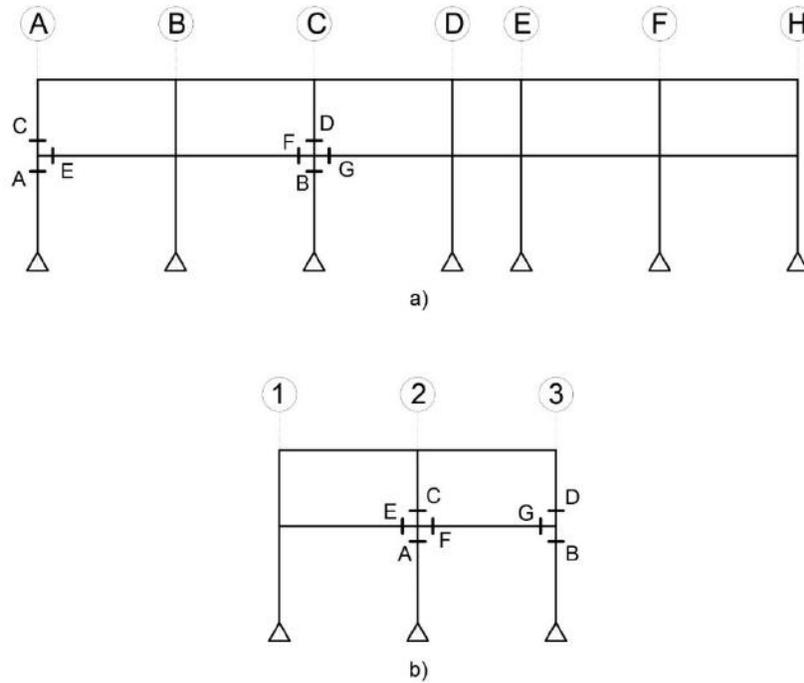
Reference frames for seismic evaluation of the existing building: a) Frame 1 and b) Frame B.
